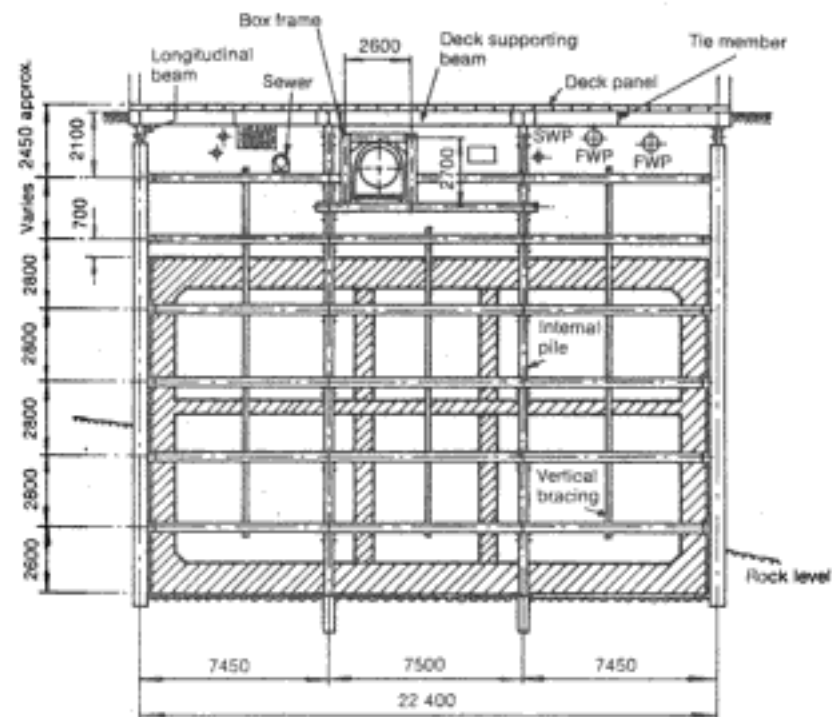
Tsim Sha Tsui station, Hong Kong Metro: typical cross-section of cut-and-cover station constructed by bottom-upwards method showing temporary deck support (McIntosh et al.²)
